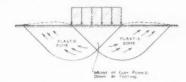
Diagram illustrating mechanism of failure in shear beneath a footing.
